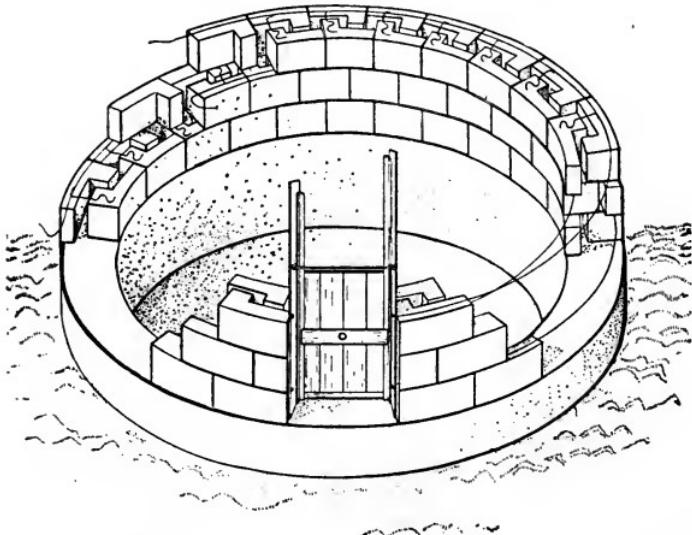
Showing how the two-piece cement block is laid in the wall and the door frame.
